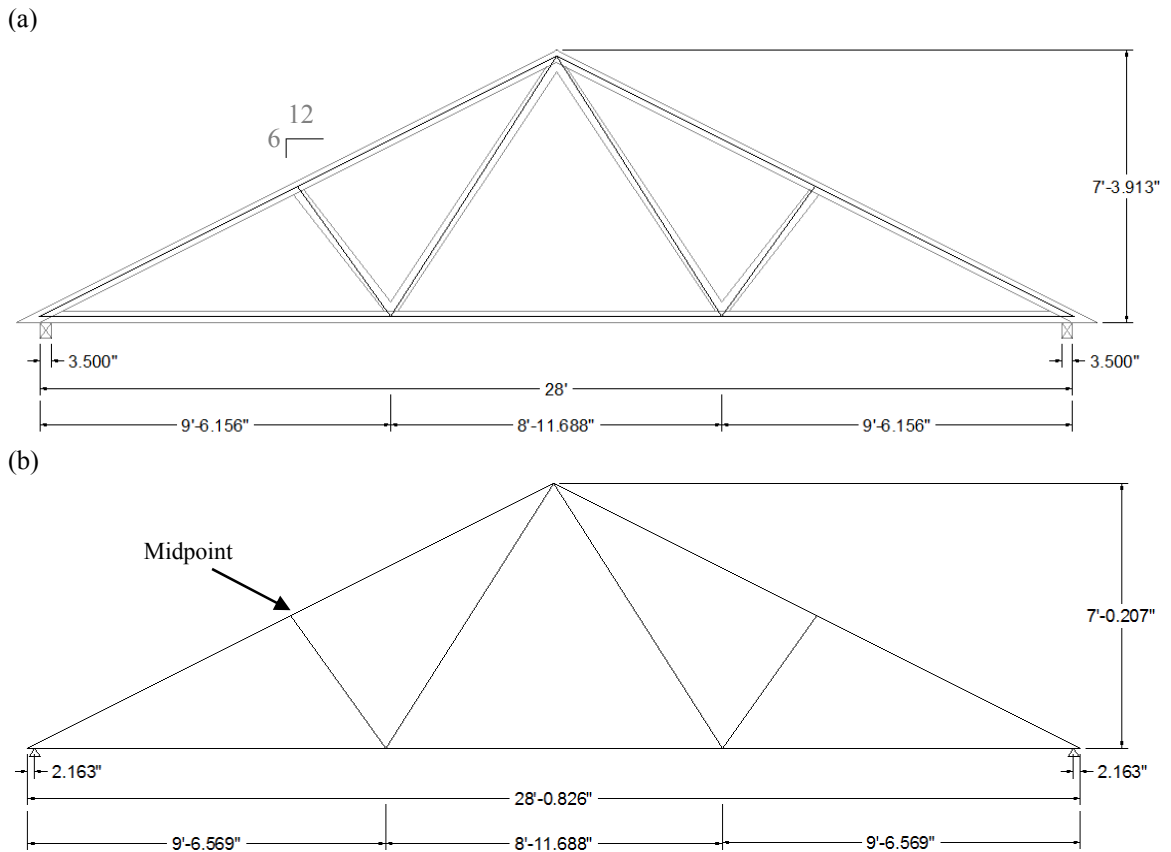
6:12 Truss Geometry – (a) Actual truss from Wolfe and LaBissoniere (1991) and (b) centerline model used in SAP2000.
